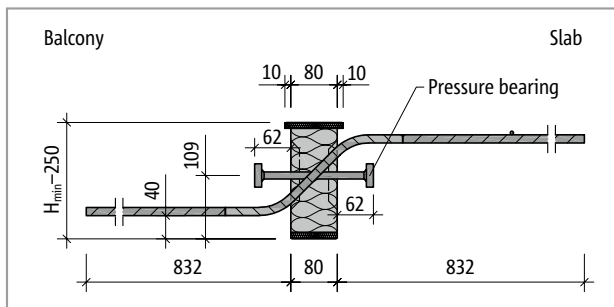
Schöck Isokorb® T type Q-P-V10: Product section
